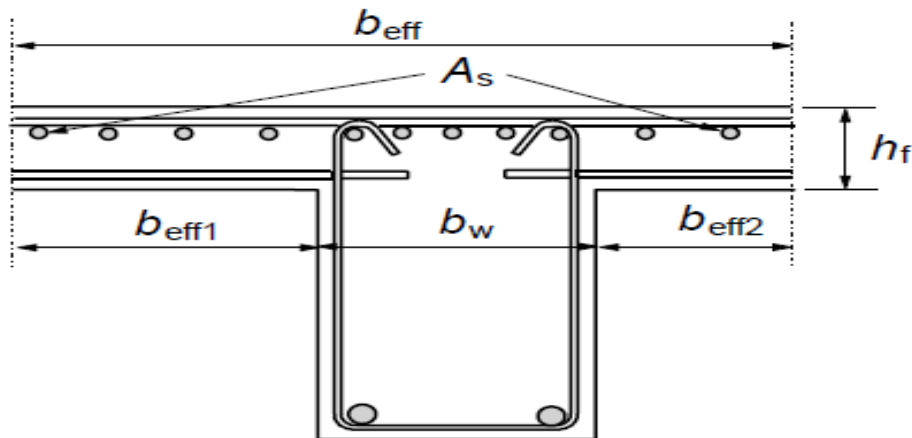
Distribution of tension reinforcement in flanged cross section
